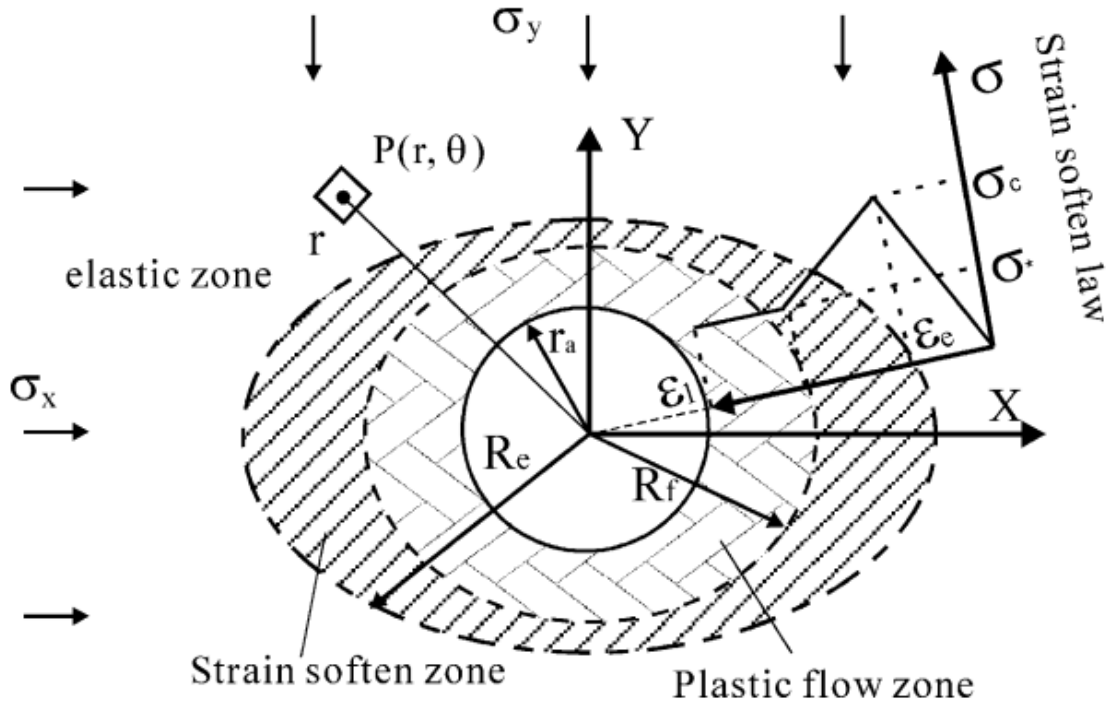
Rock deformations in tunnel cross-section (Cai *et al*, 2004 b)
